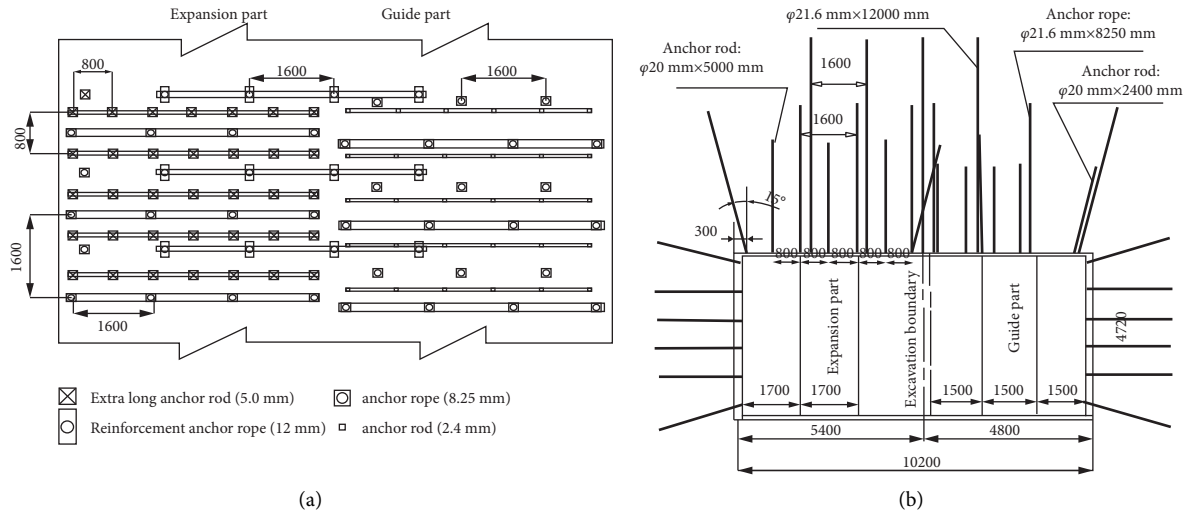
Layout of 1105 incisional eye support. (a) Layout plan of 1105 notch roof support. (b) Section view of top plate support layout of 1105 cut.
